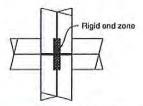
Joints are modelled with rigid column offsets and no beam offset (ASCE/SEI, 2014)
